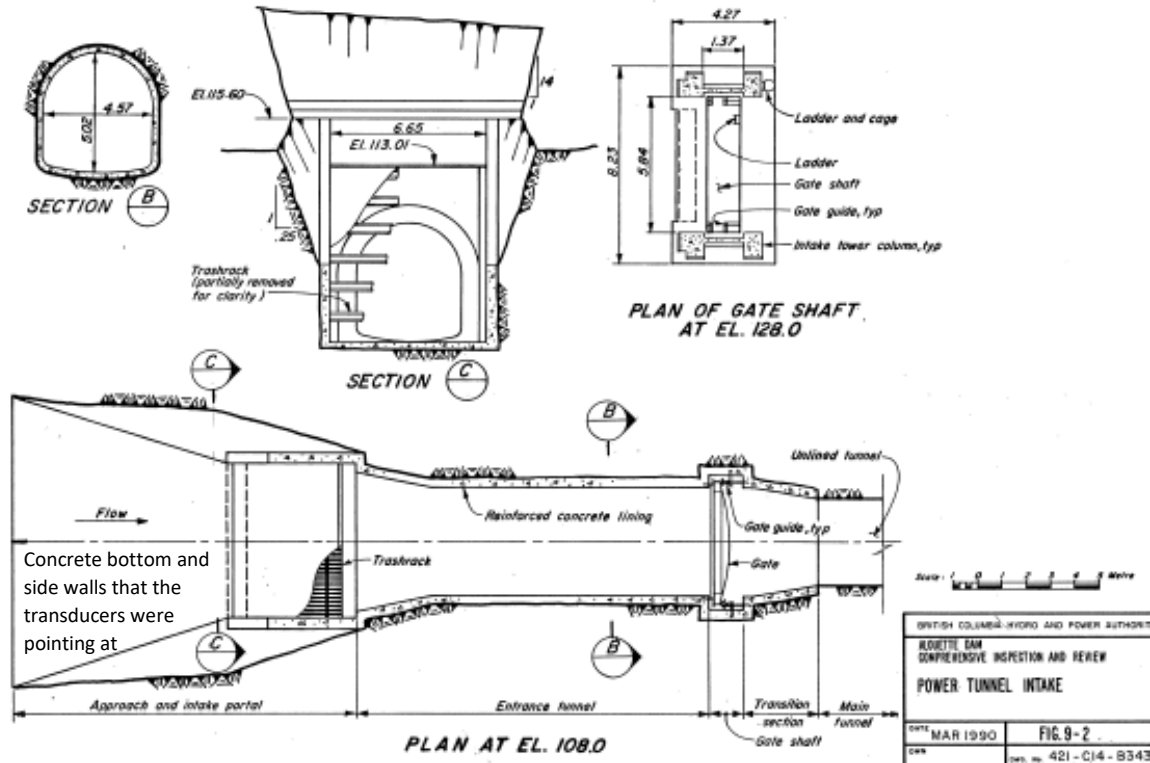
Sections through the Headworks Tower showing the dimensions of the Tunnel entrance at the trash rack (7 m high x 6.65 m wide), the Tunnel behind the trash rack (5.02 m high x 4.57 m wide) and the entrance area to the Tunnel with a concrete bottom and sidewalls that the transducers were pointing at (Source: BC Hydro).
